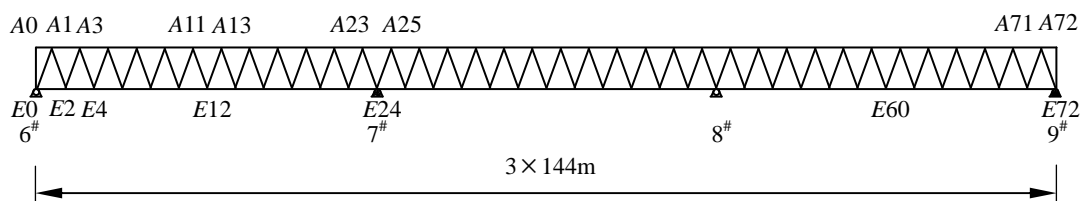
The continuous steel truss girder of the Wuhu Yangtze River Bridge
